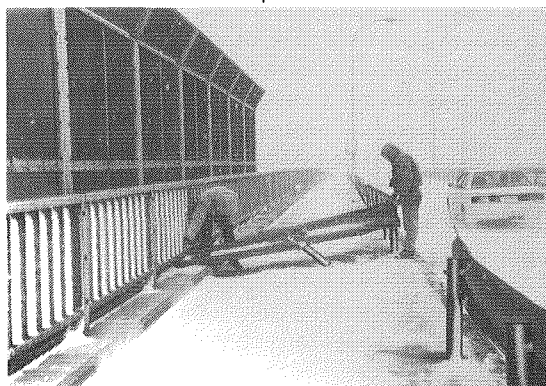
Damage to the guardrail on the Hachinohe-Ohashi bridge
